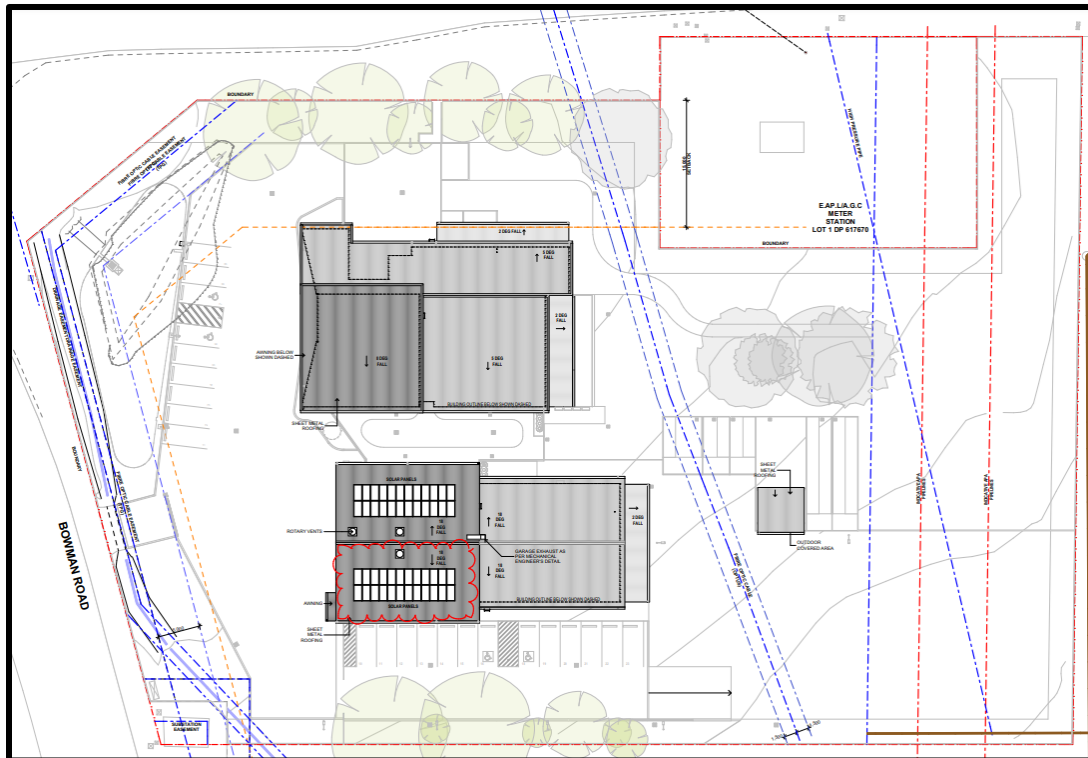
Roof Plan (Source: Figgis + Jefferson Tapa)
